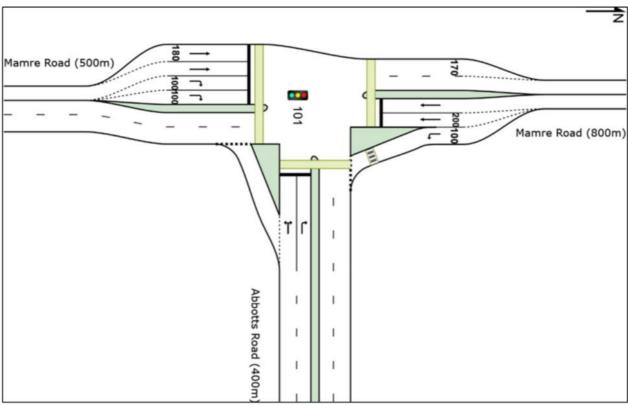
Interim 2026 SIDRA Intersection Layout - Mamre Road/Abbotts Road (Source: Ason Group 2021
